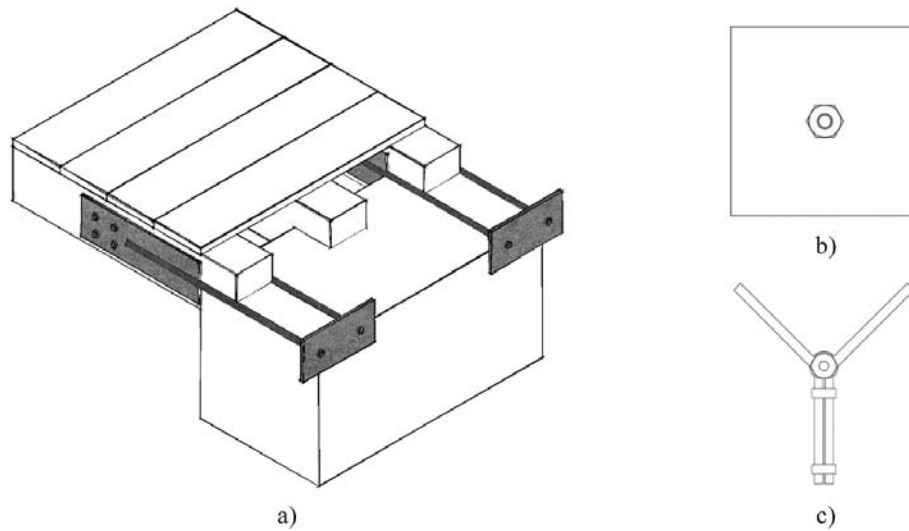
Example of floor-to-wall connection (a) and of external anchors (b, c).
